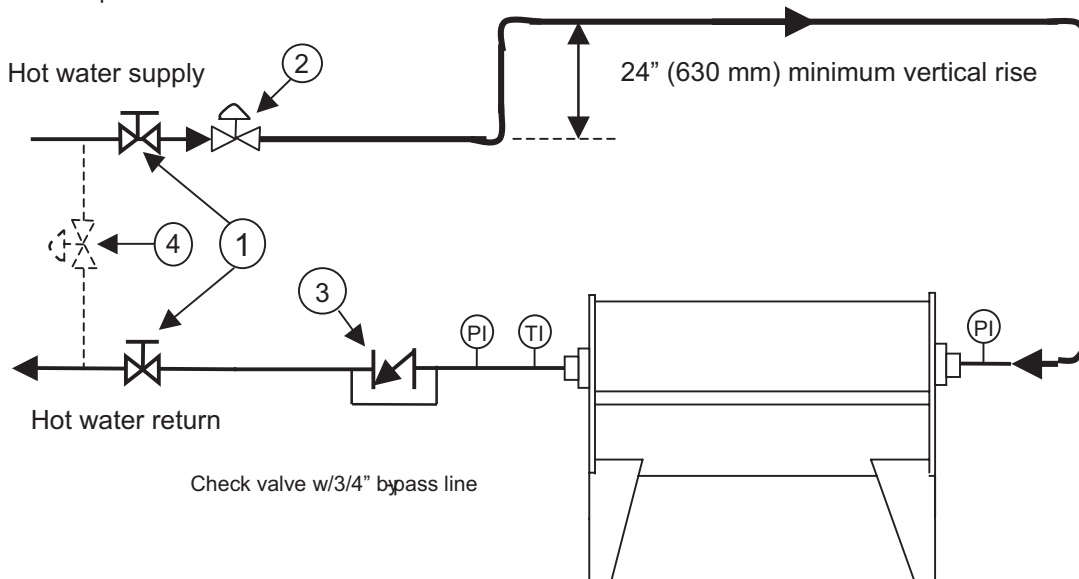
TYPICAL 2-WAY CONTROL VALVE ARRANGEMENT
